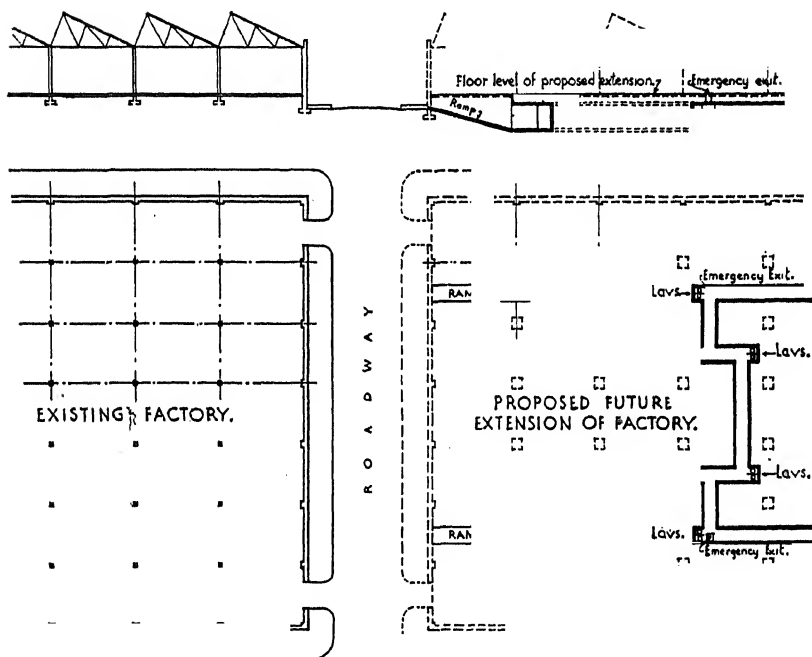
Showing planning of trenches adjoining factory to allow of future extension of the premises.
